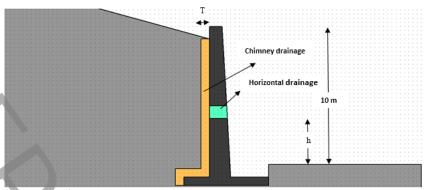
The retaining wall with 10 m height including horizontal and chimney drainage
